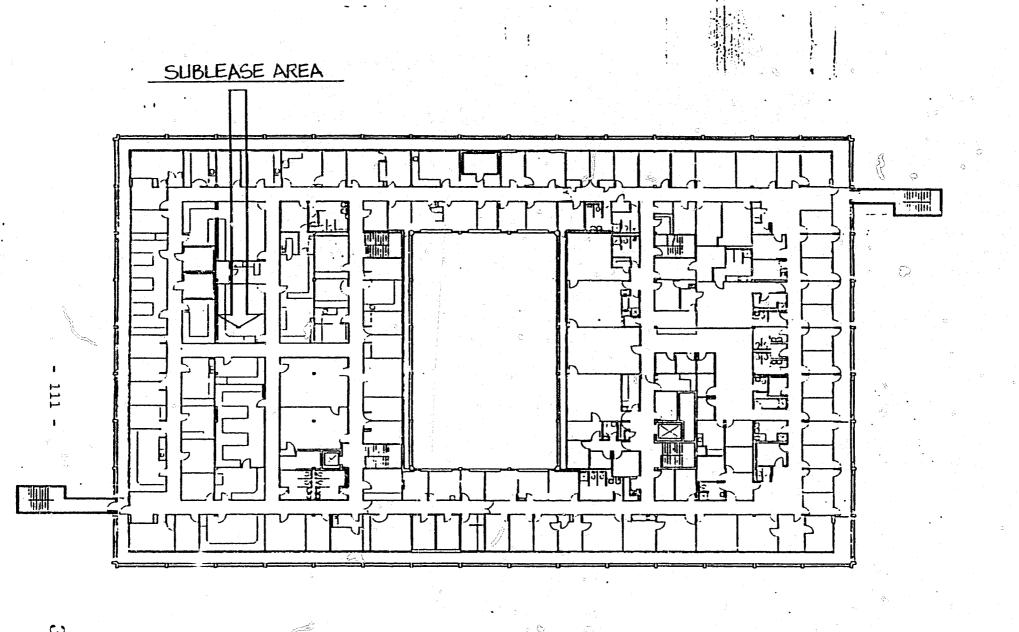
FIRST FLOOR PLAN O MSI-1
